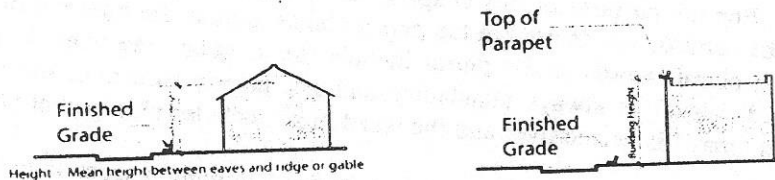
This illustration shows the appropriate way to measure building height for both pitched and flat roofed structures.
